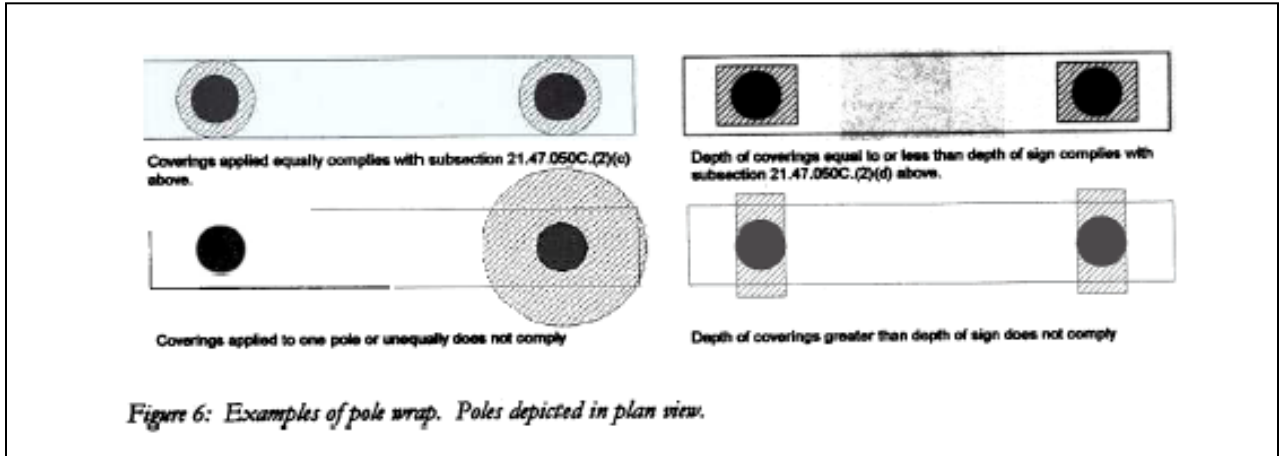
Examples of pole wrap. Poles depicted in plan view.
